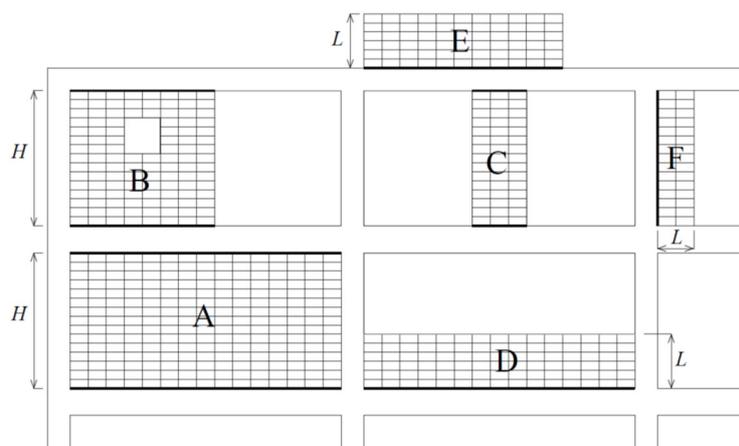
General nonbearing walls (A,B,C) and cantilever nonbearing walls (D,E,F)
